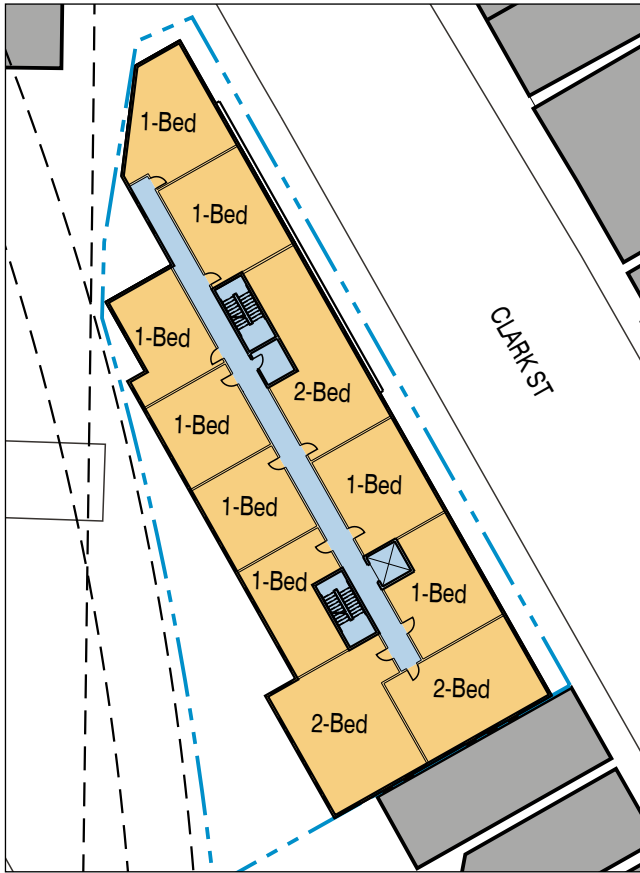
RPB 04 Development Concept Residential Floor Plans 2-3
